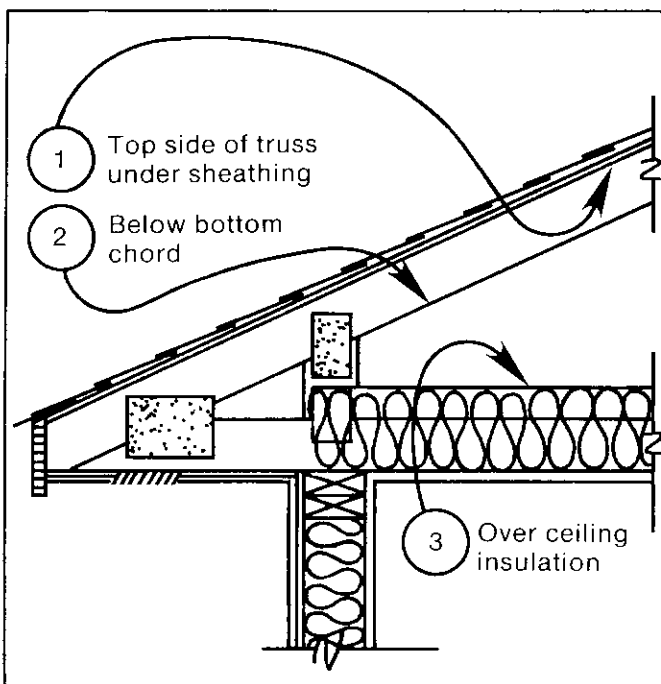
Typical Attic Section with Three Possible Locations for a Radiant Barrier
